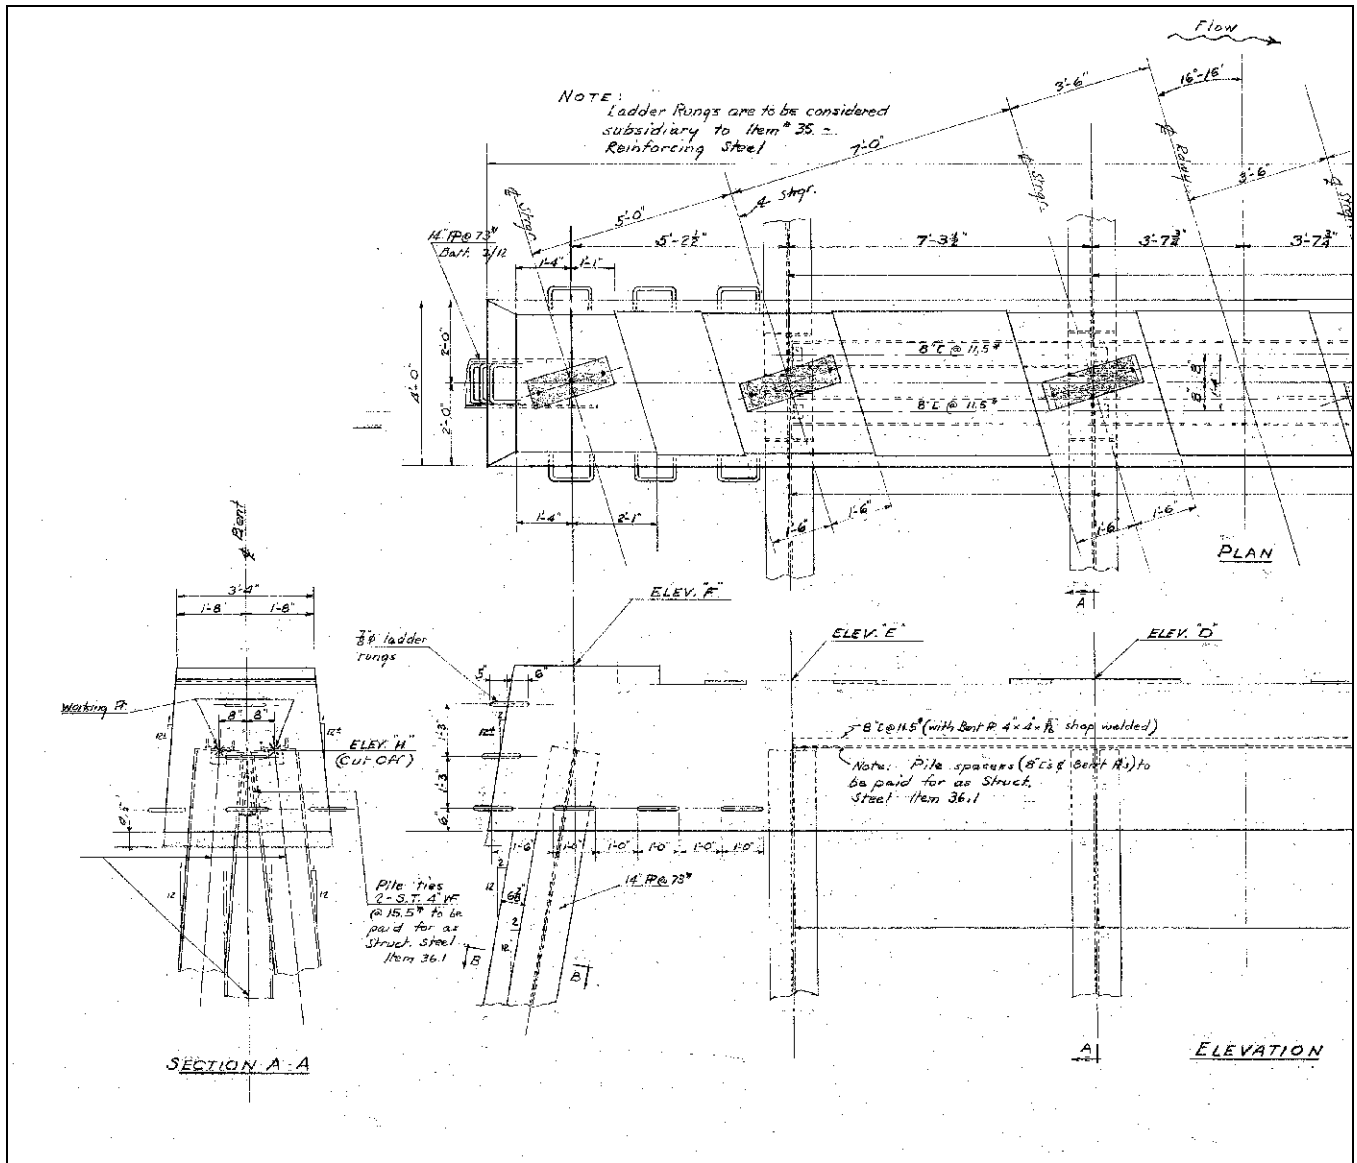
Plan, elevations and section of H-pile bent from original drawings (NHDOT File No. 3-4-3-2).
